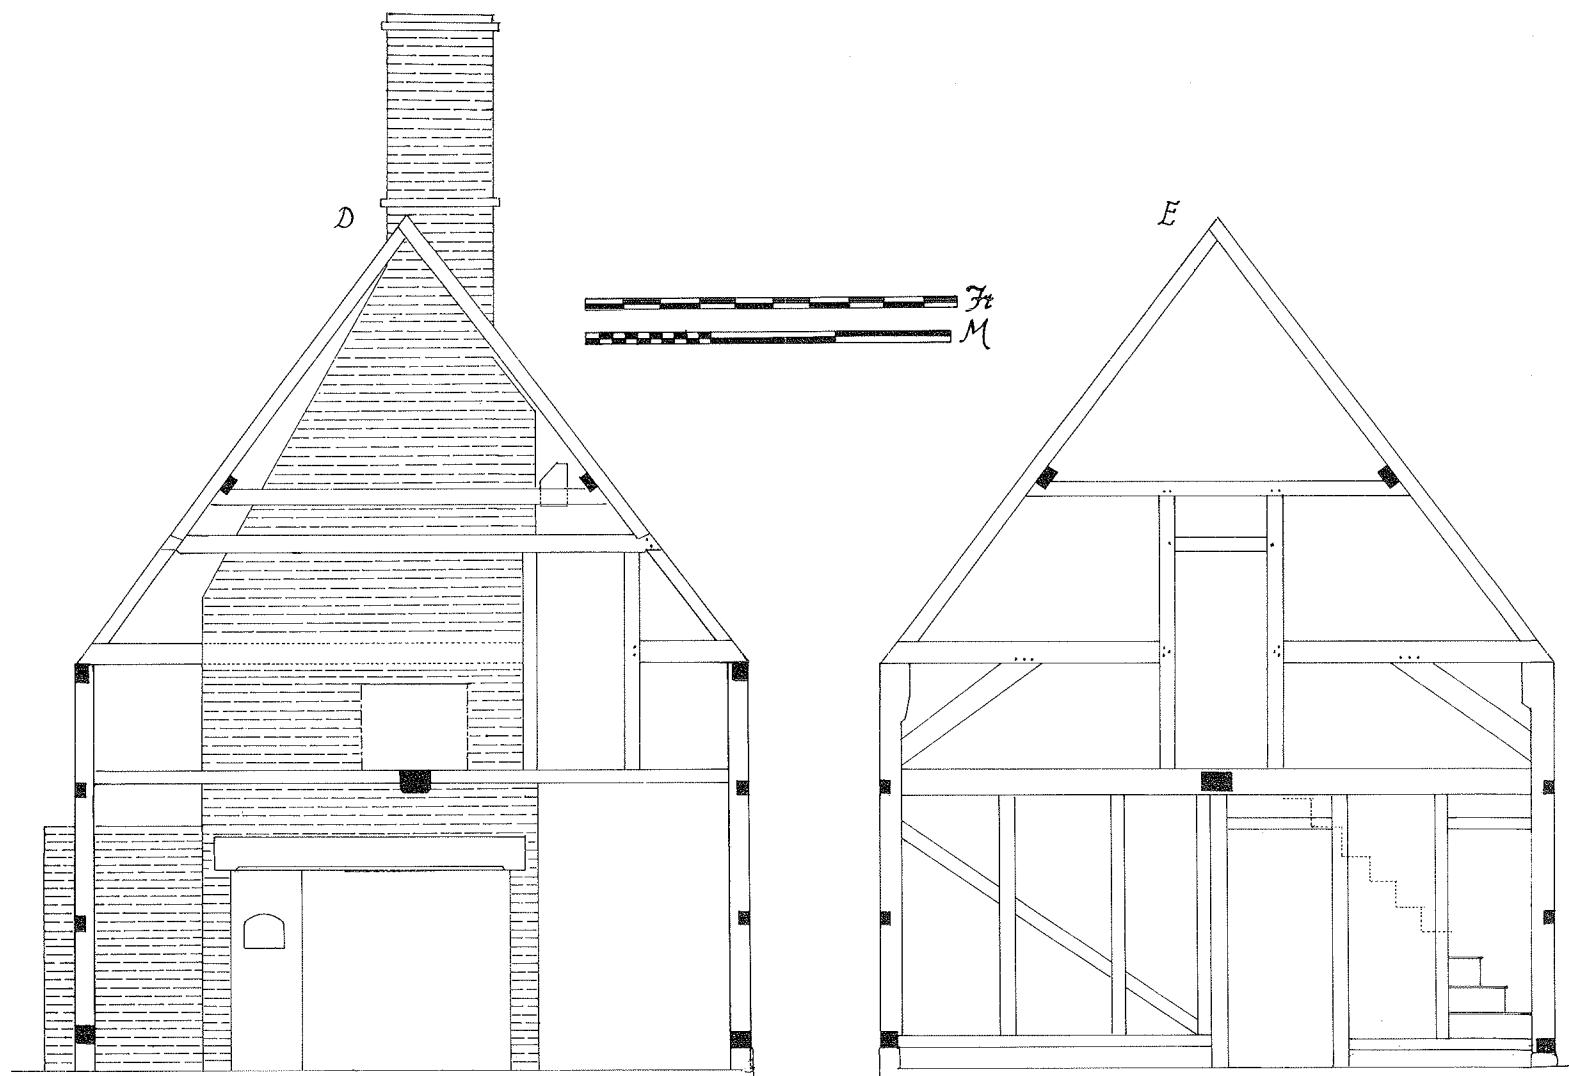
Left: Section at D, looking W. Right; Section at E, looking E.
